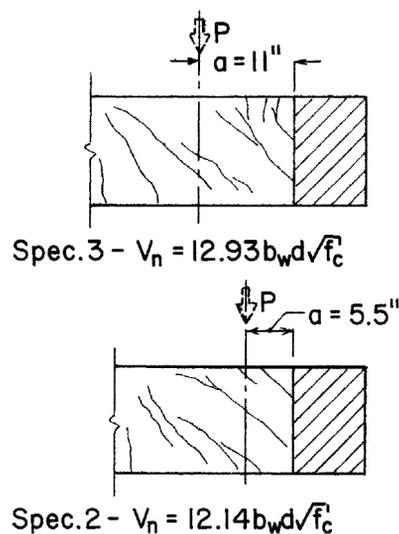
Cracking pattern of specimens 2 and 3 [7]
